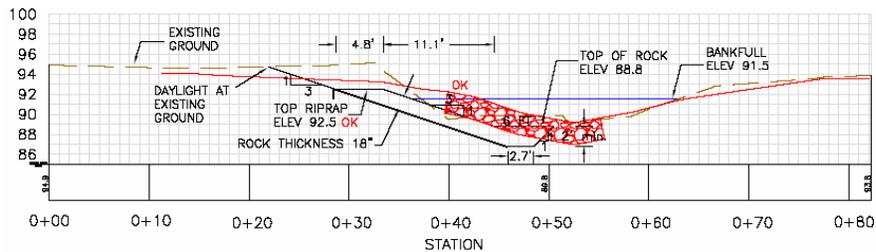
Stream cross-section showing as-built riprap upstream of crossing (looking downstream)
